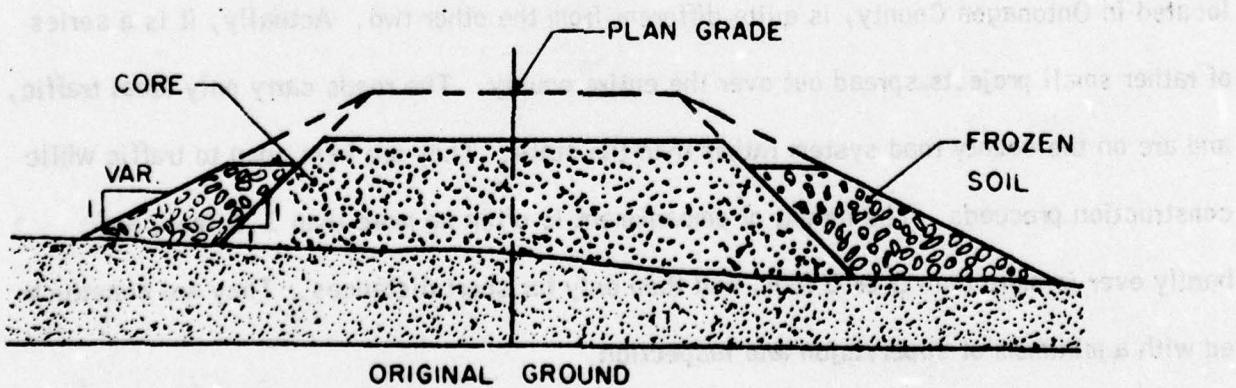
Embankment Core Concept Used in Winter Earthwork
